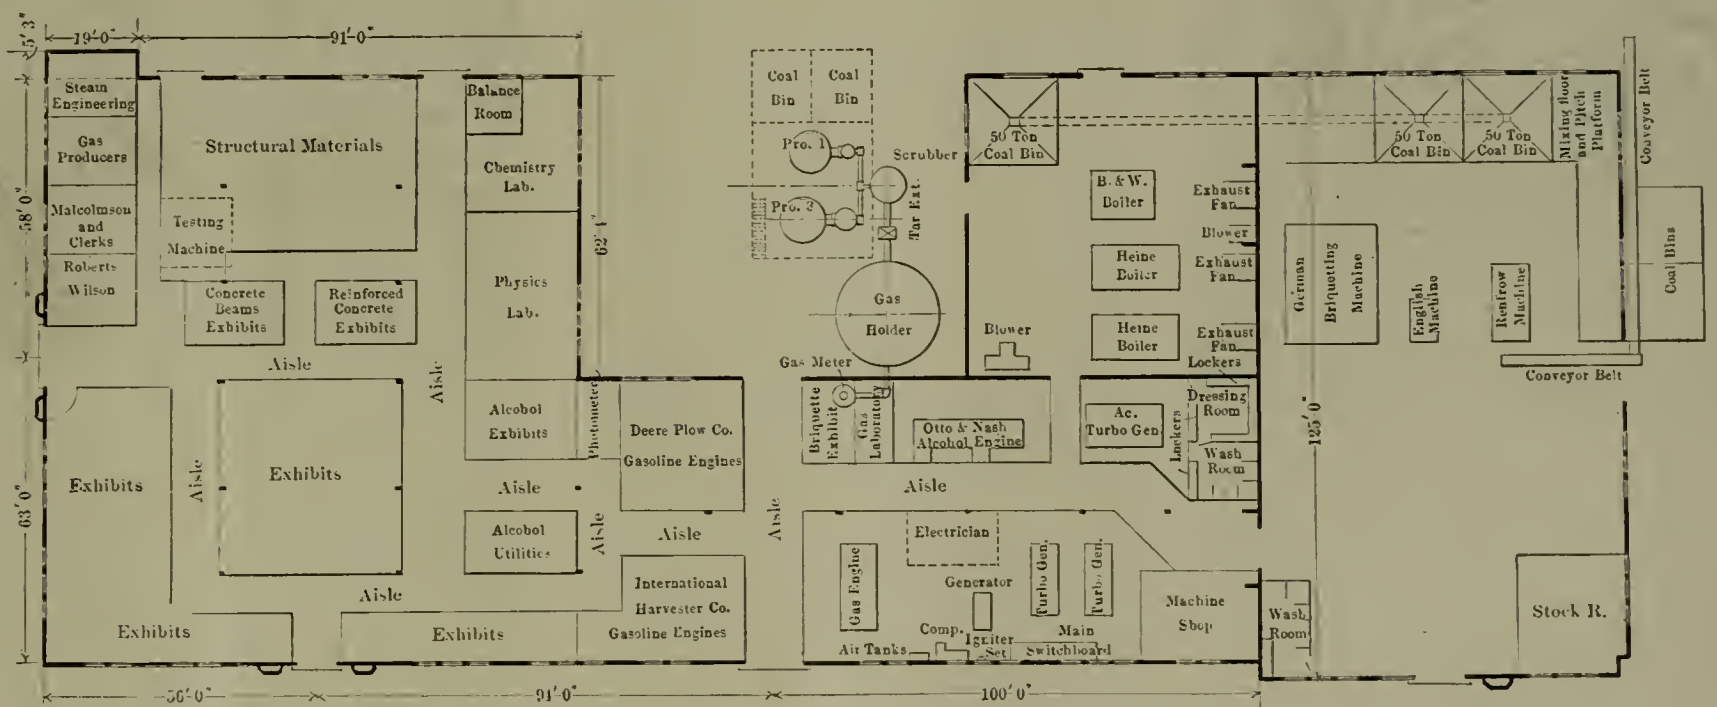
PLAN SHOWING LOCATION OF BOILERS, GAS PRODUCERS AND ENGINES.
